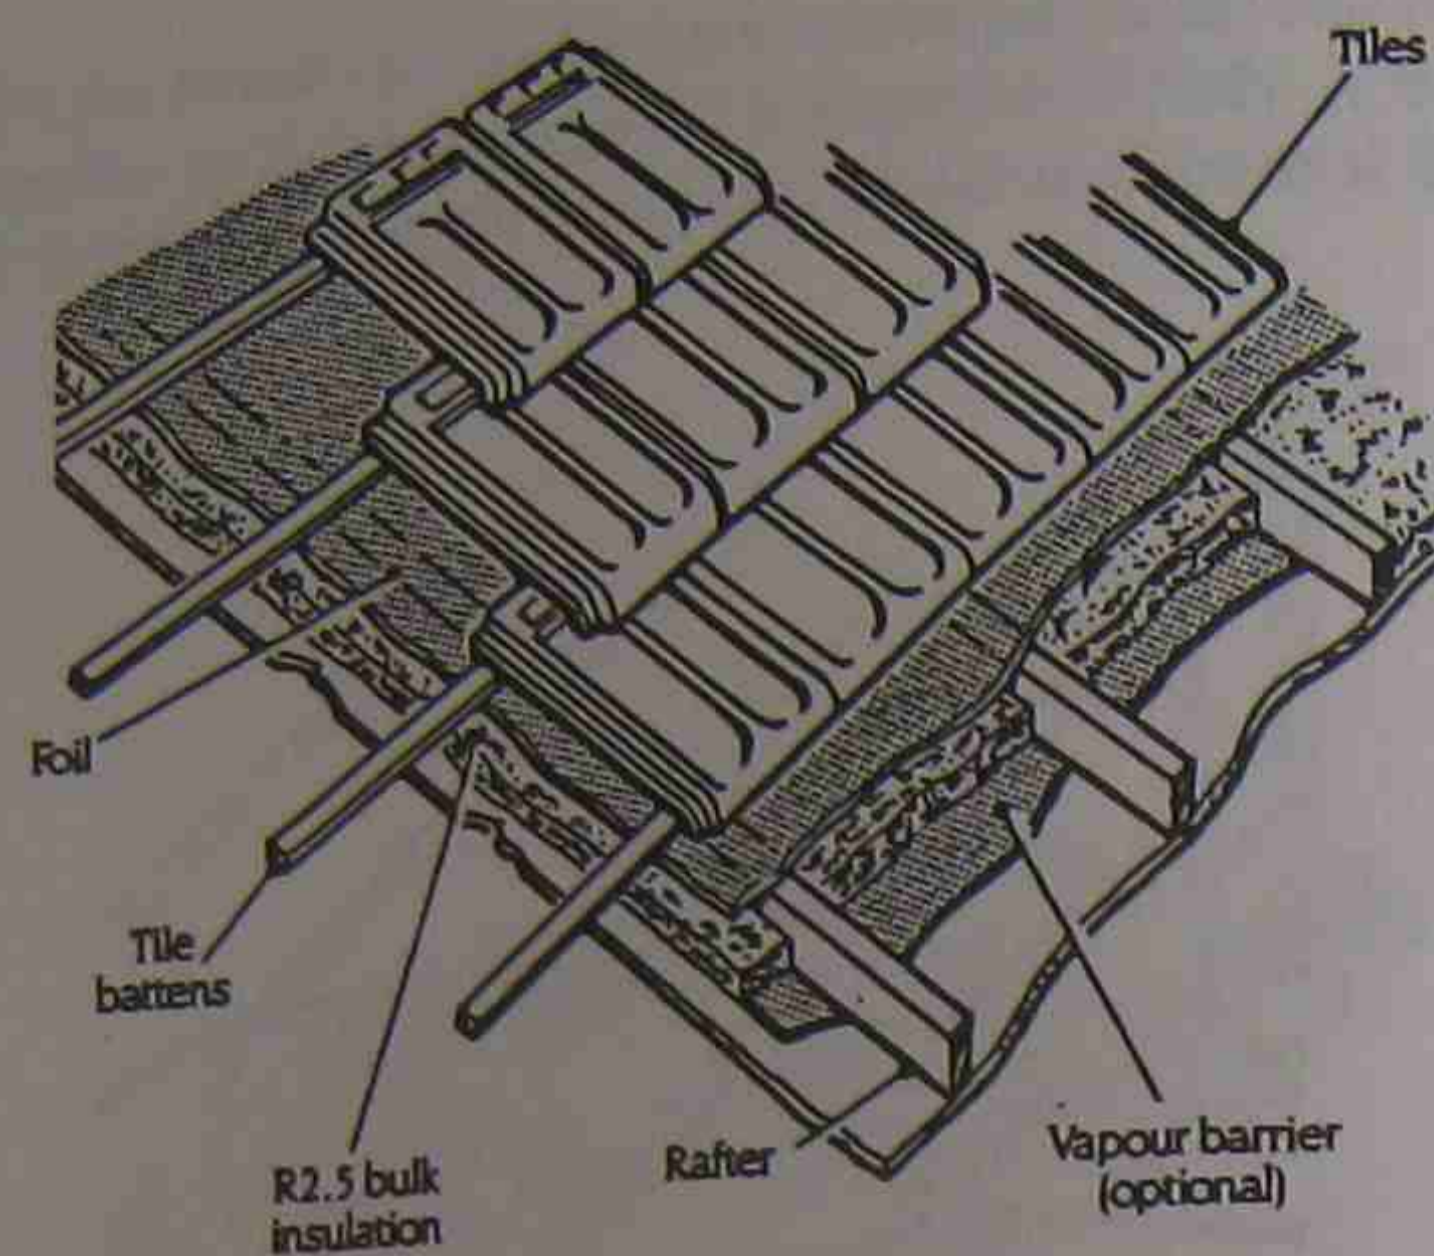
Bulk insulation and reflective foil used under a tiled roof.
